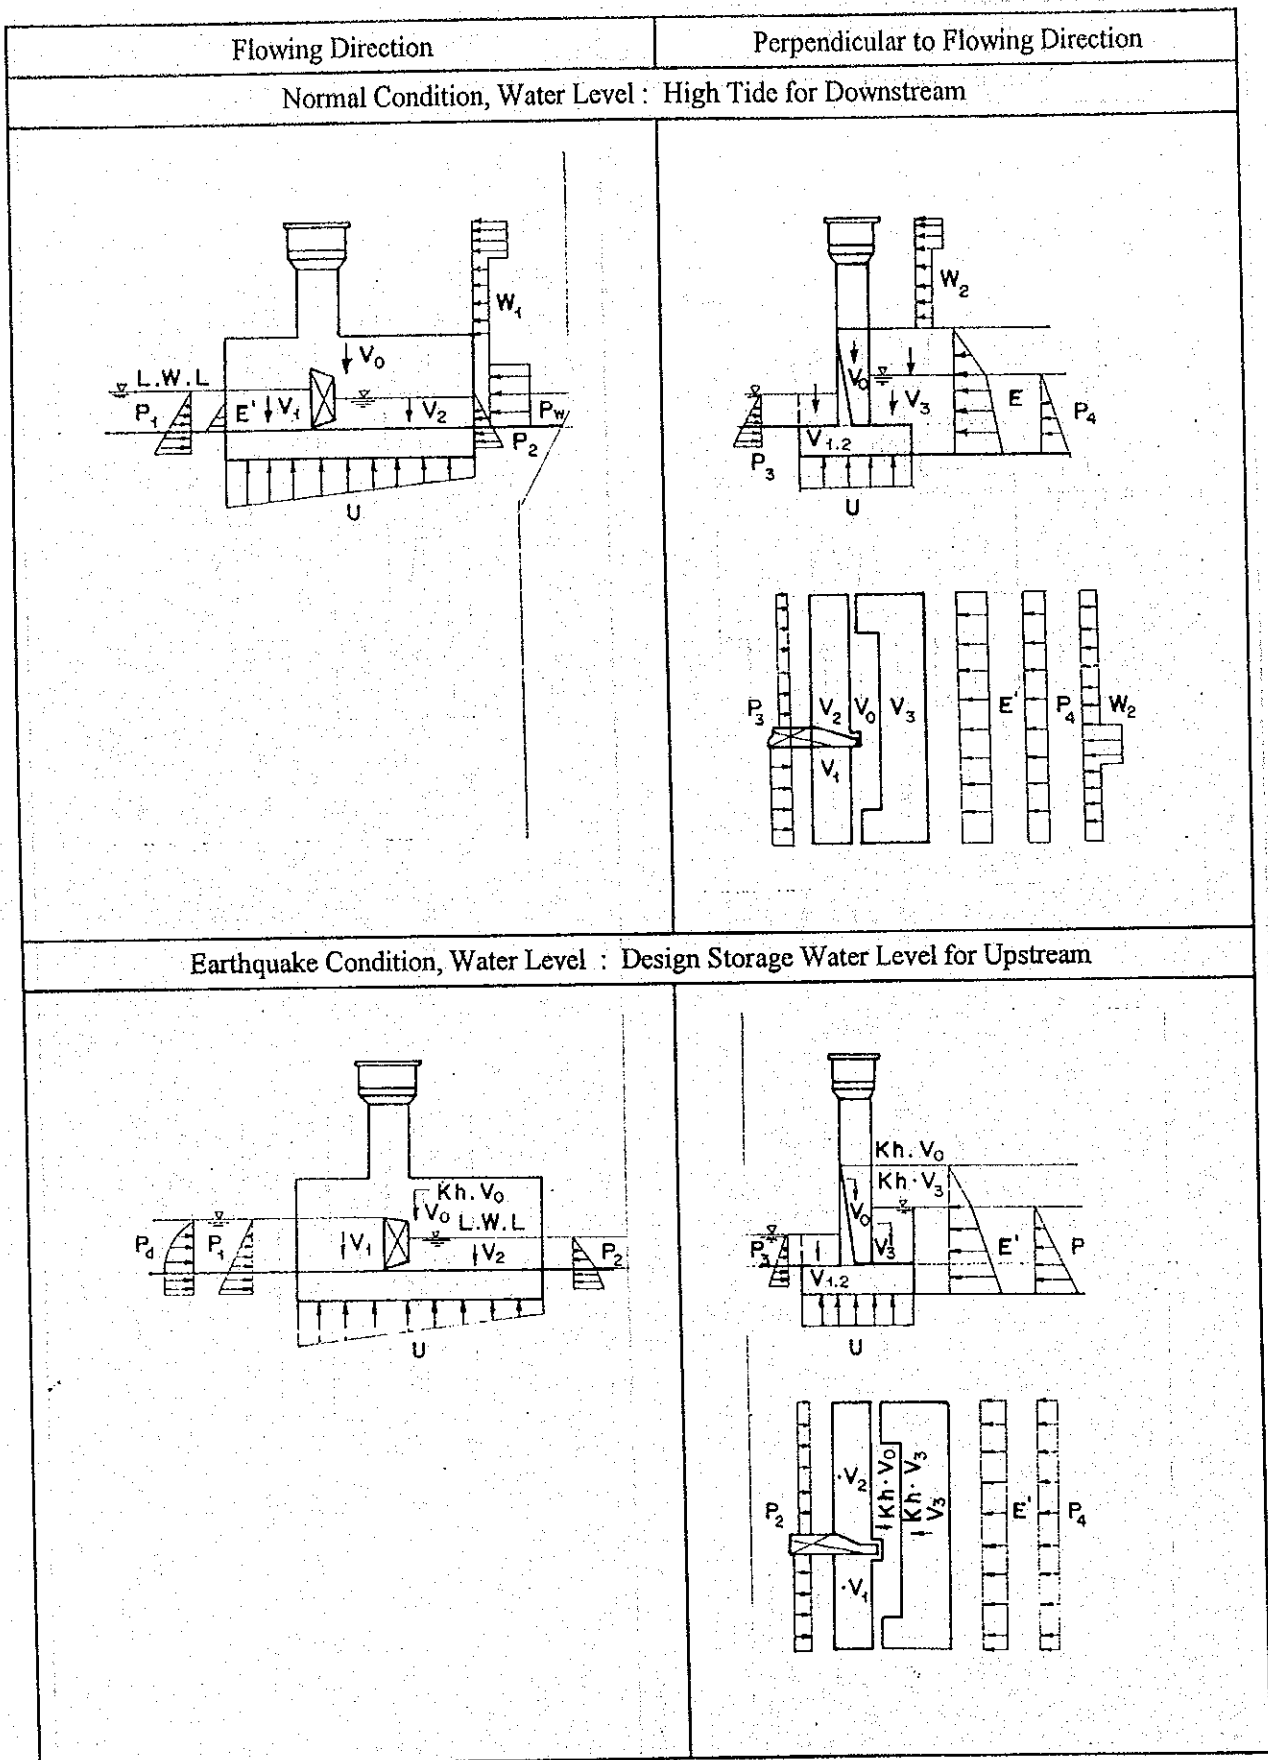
(3/4) Loading Conditions for Side Piers of Weir
